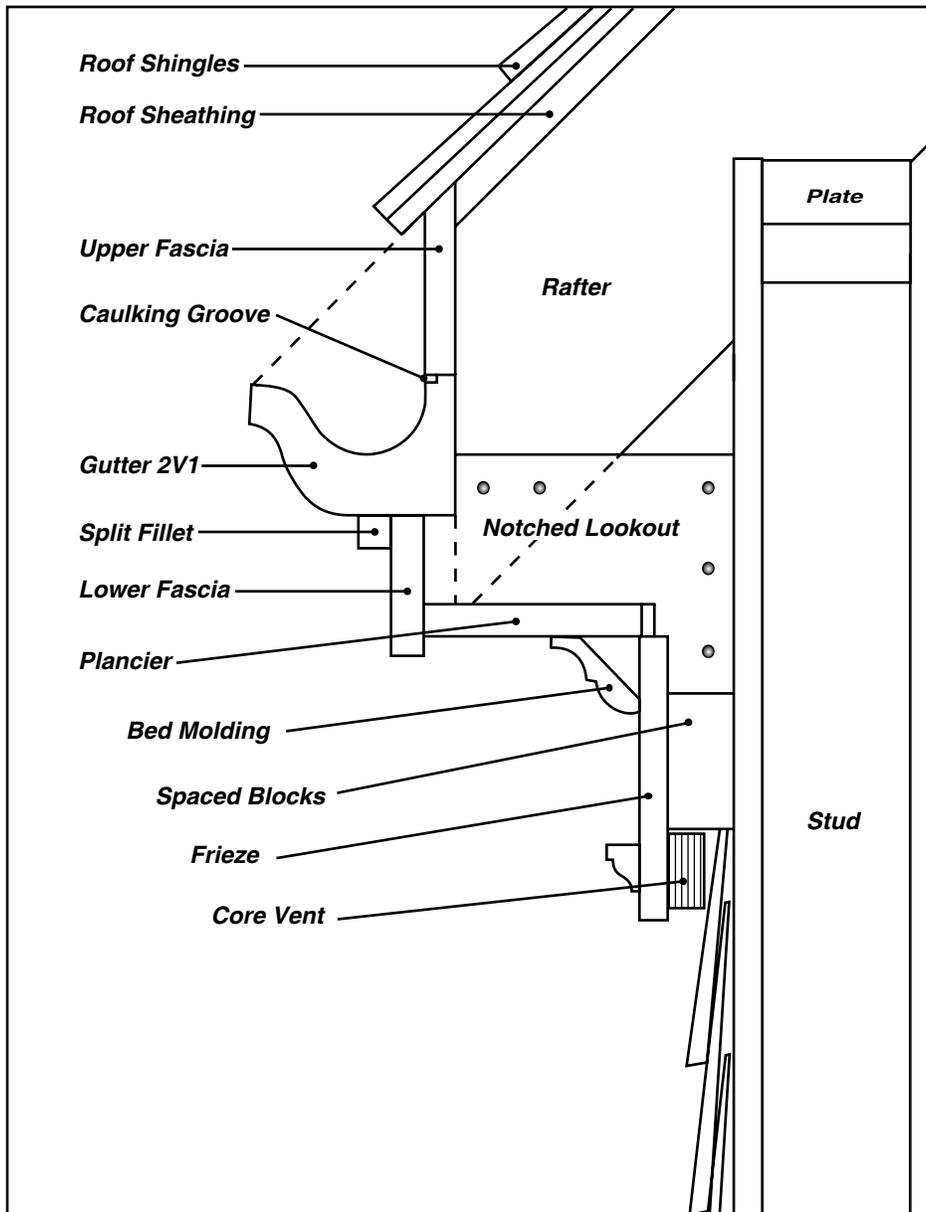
Suggested Detail Of Traditional Gutter Cornice Modified To Incorporate Continuous Eaves Vent Strip.
